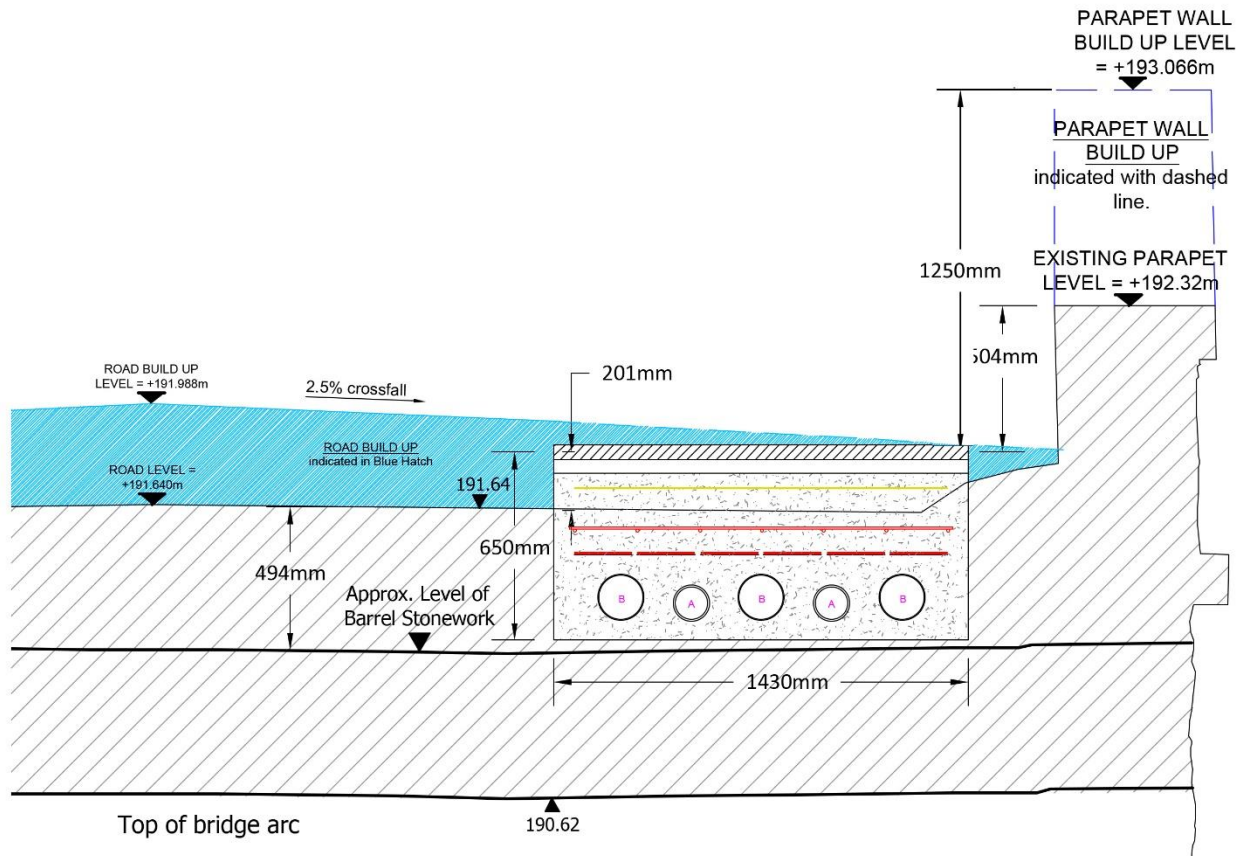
Option 1, raising the parapet by build-up of masonry in same style stone or Option 2, raising the parapet by build-up of masonry in deliberately different stone
